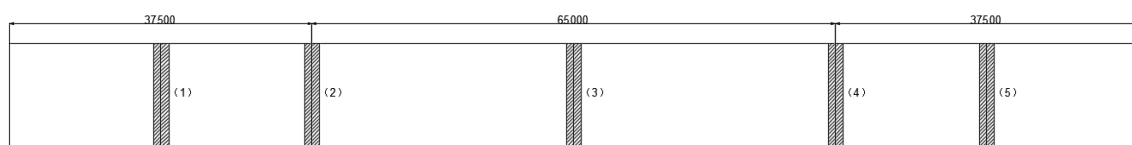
Crack damage of continuous variable section box girder (overlooking)
